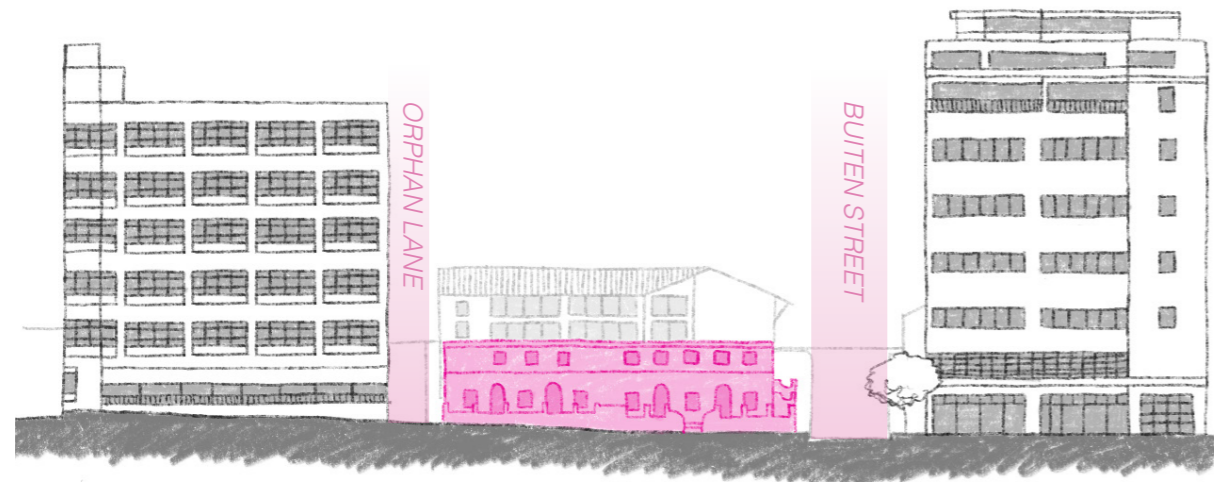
ELEVATION OF SITE ALONG LOOP STREET
